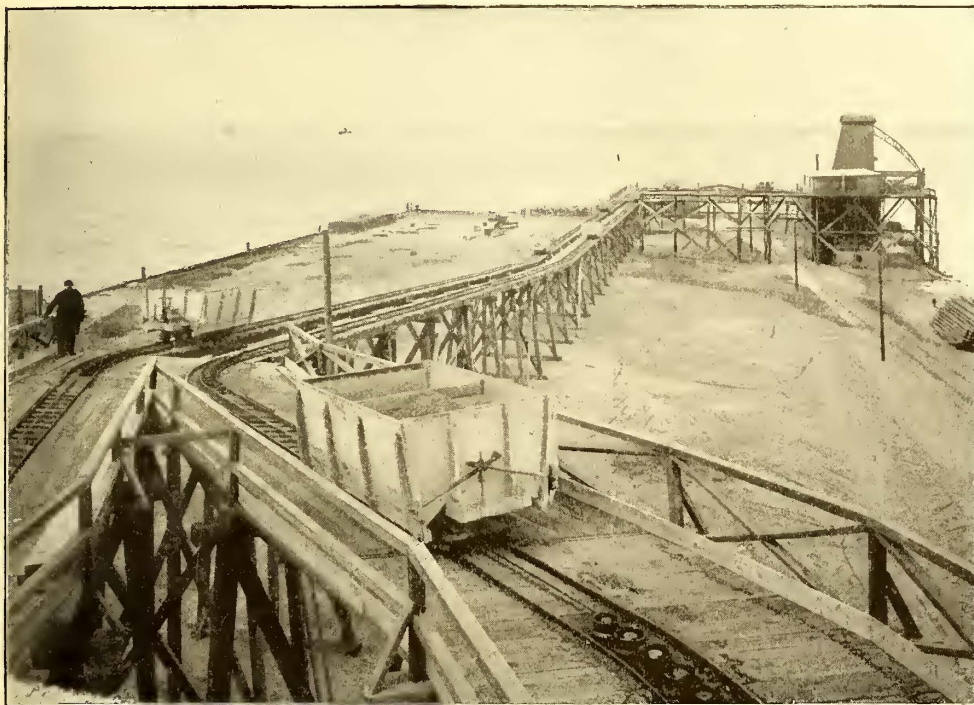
VIEW OF CABLE RAILWAY FROM COAL POCKET—SOUTHERN STATION OF BROOKLYN CITY RAILWAY.
